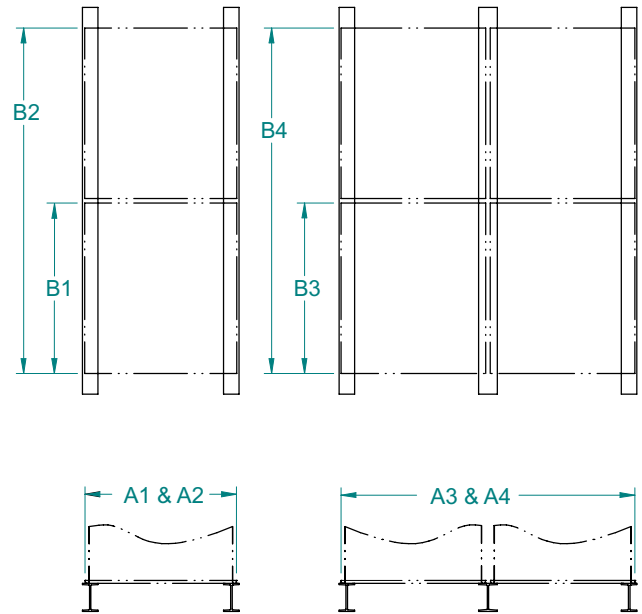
IDSC/ECOSS™ Steel Support Dimensions (See Table for Dimensions)
